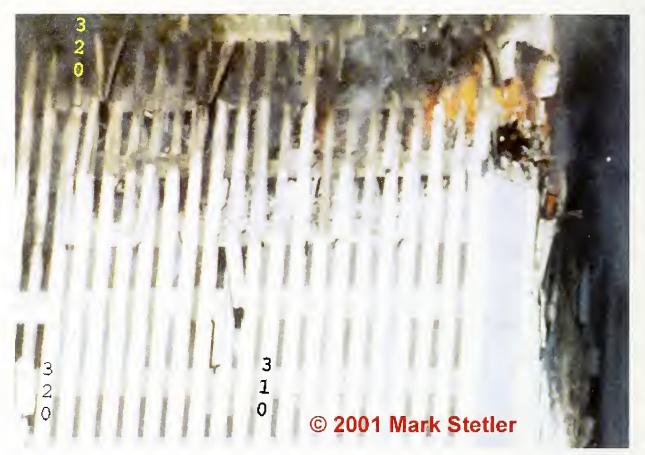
This photograph is cropped from the image shown in Figure H–6. It was taken on September 11 and shows the east face of WTC 2 at the northeast corner from floor 77 to floor 82. Note the large piles of debris evident on floor 80 and floor 81.
